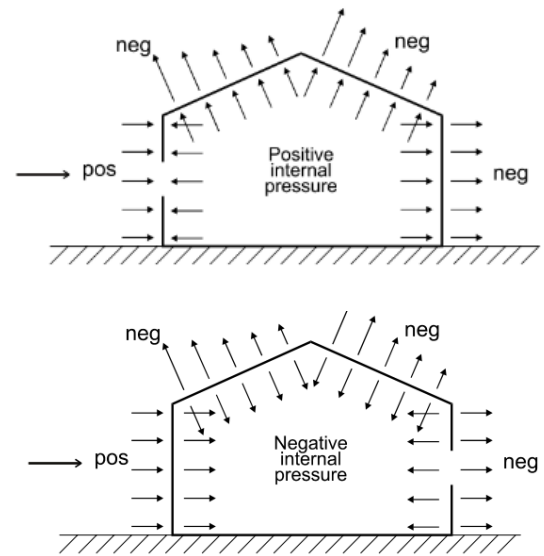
Internal wind pressure on roof and wall surfaces.
